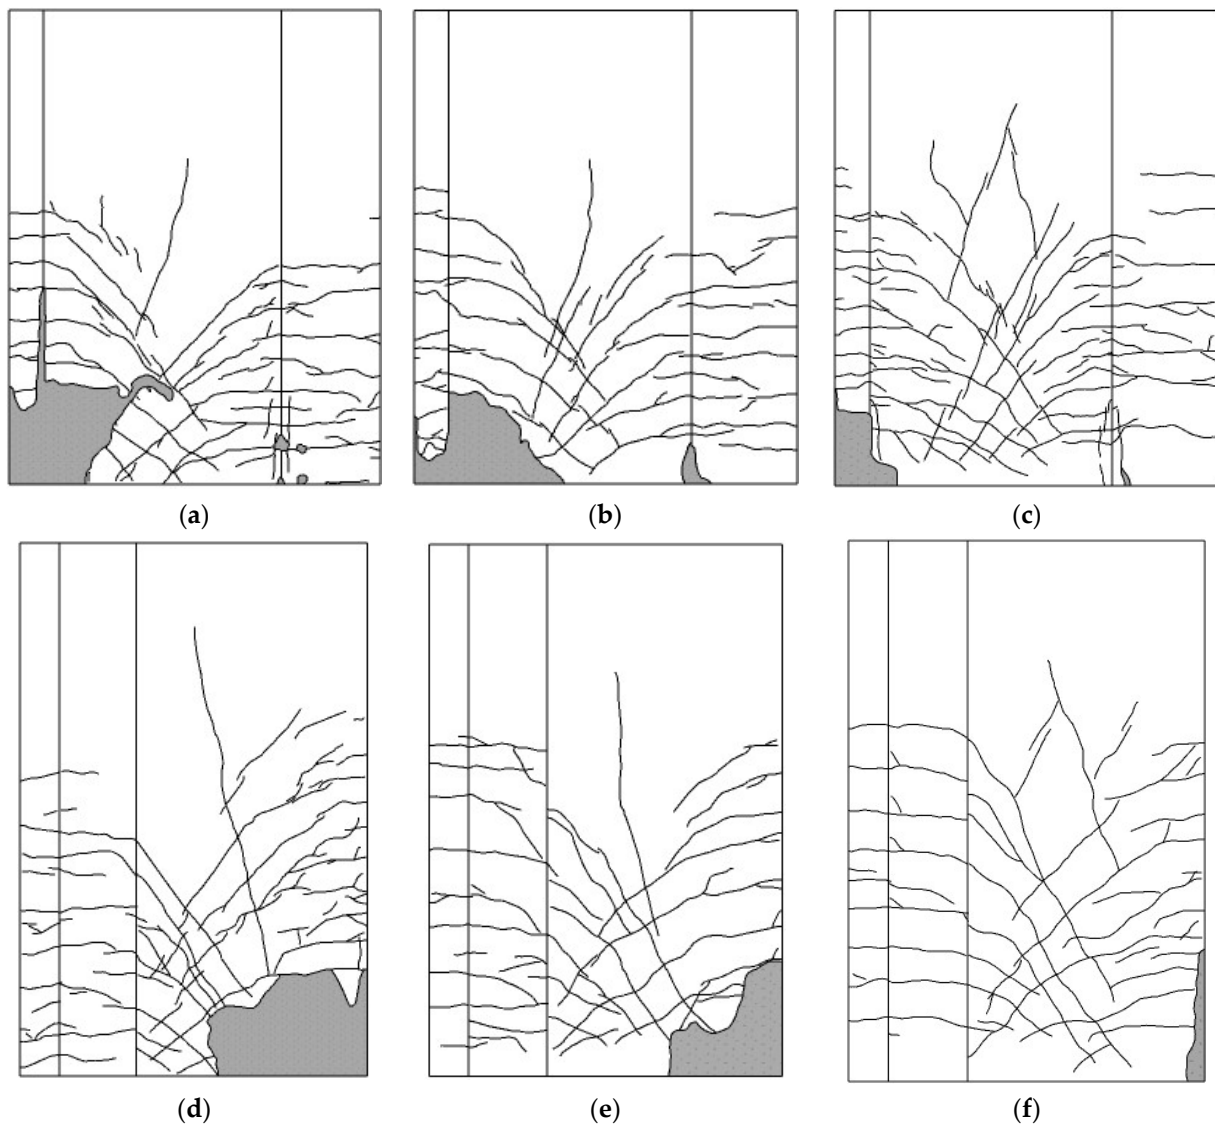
Schematic of the failure of specimens at the limit state: (a) crack development view of the front and side of LSW; (b) crack development view of the front and side of LAPC-1; (c) crack development view of the front and side of LAPC-2; (d) crack development on the back of LSW; (e) crack development on the back of LAPC-1; and (f) crack development on the back of LAPC-2.
